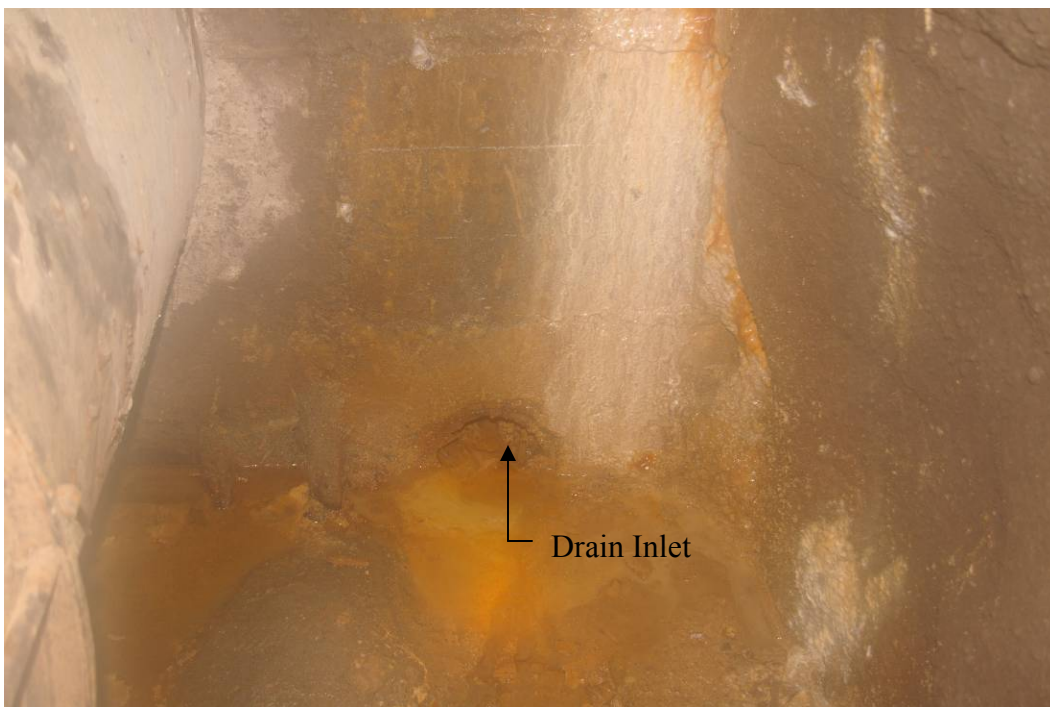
(October 9, 2007) East Supply Tunnel, East Bulkhead (looking upstream) – Inlet of drain pipe at east portal bulkhead. Bulkhead is damp to wet but no distinct areas of seepage were noted.
